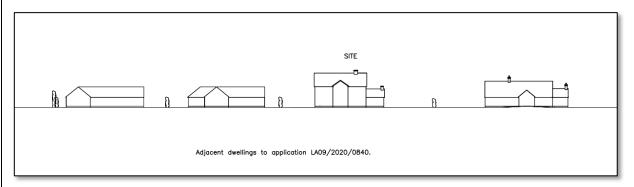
How the proposed dwelling would read with existing dwellings along Coole Road
